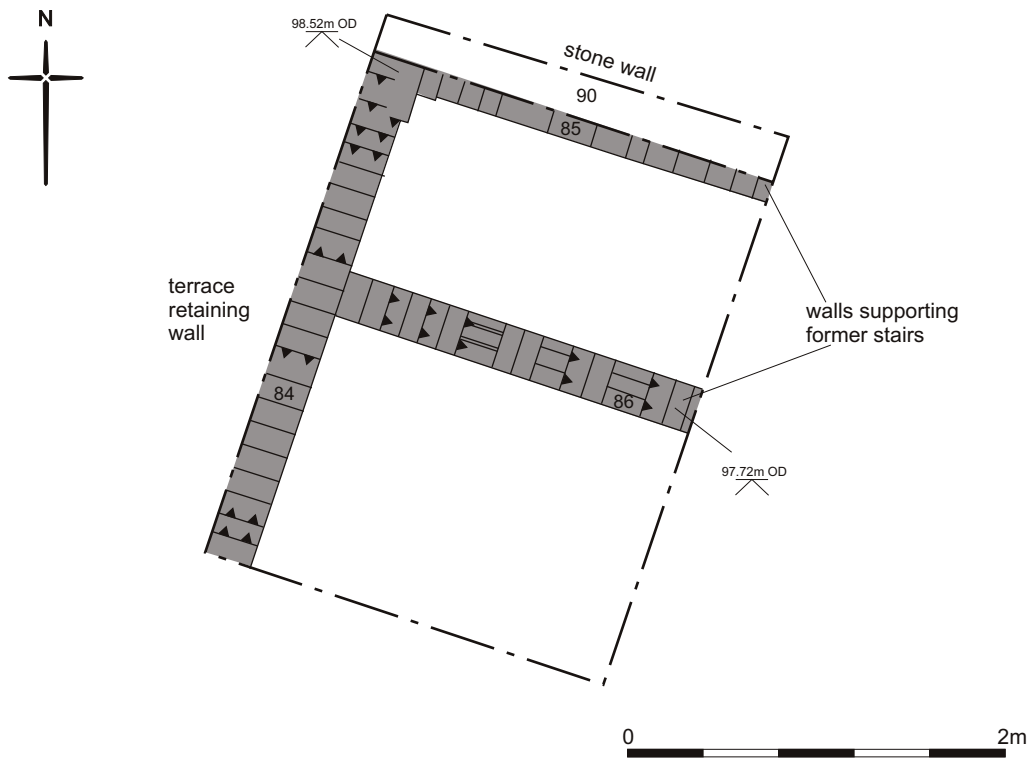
Test Pit 2, plan of terrace retaining wall and supports for former stairs
